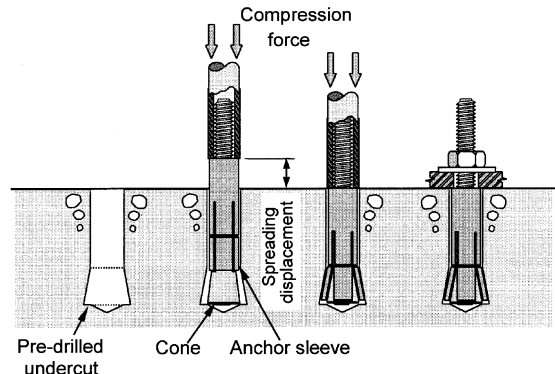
(b)—Type 2 undercut anchor. Displacement-controlled anchor set in predrilled undercut by hammering sleeve over cone.
